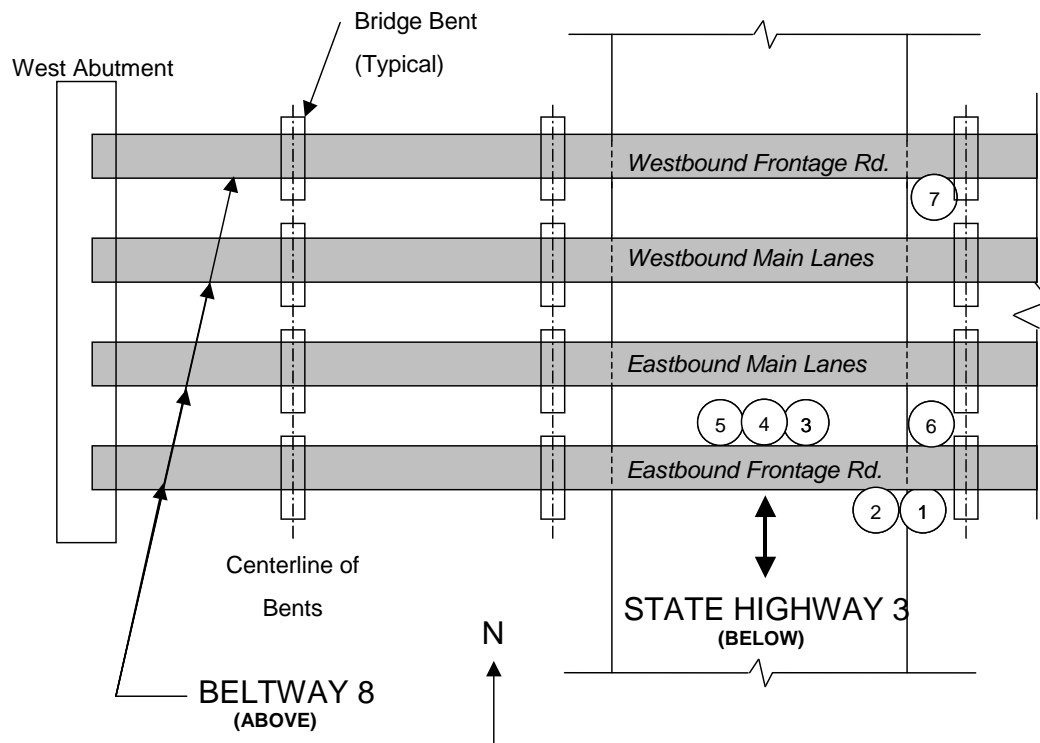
Schematic of crack-measurement locations on Beltway 8 structure (plan view)
